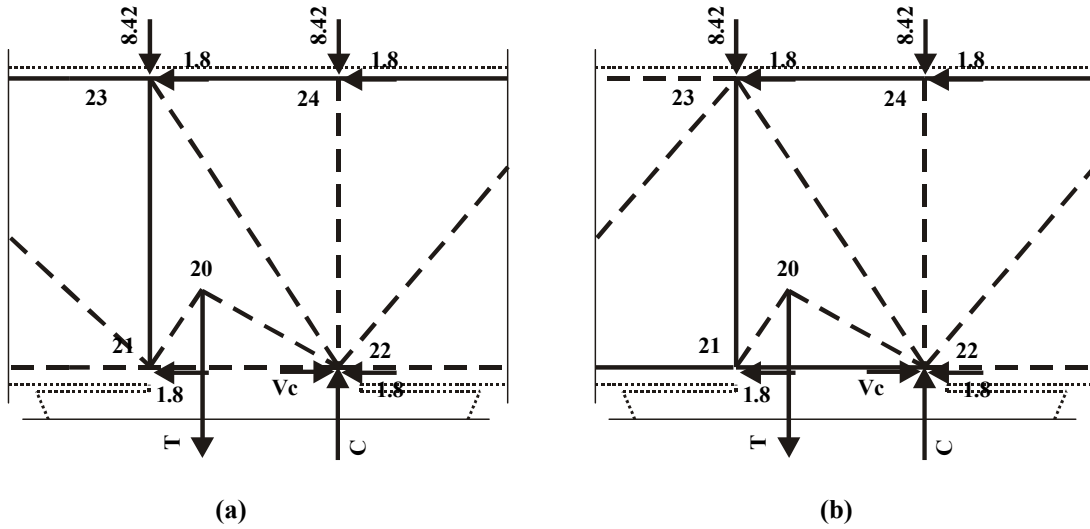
Node Numbering for Beam-Column Connection Strut-and-Tie Model (a) West Joint
